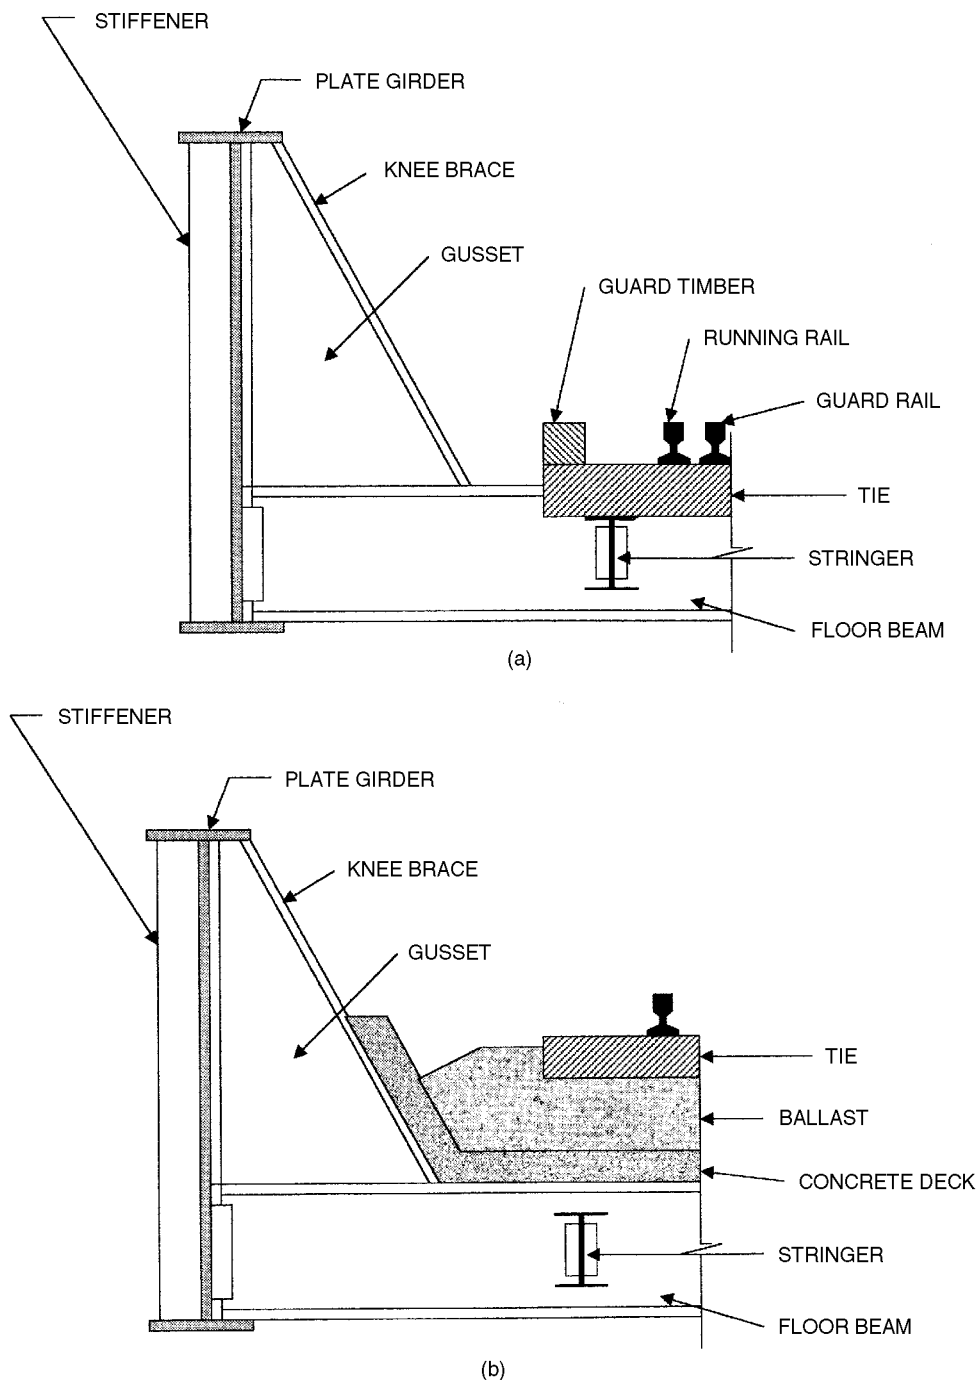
Part section of through-girder railway bridges. (a) Open deck construction. (b) Ballast deck construction.
